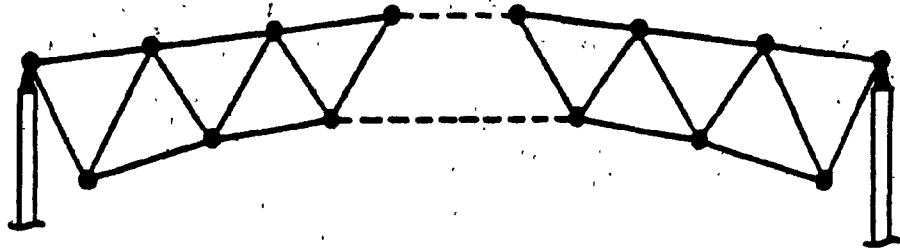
THE RING TRUSS PROFILE RISES ABOVE THE COLUMN HEIGHT. THE TRUSS IS SUPPORTED AT ITS UPPER SURFACE, AND HAS VARYING DEPTH.
